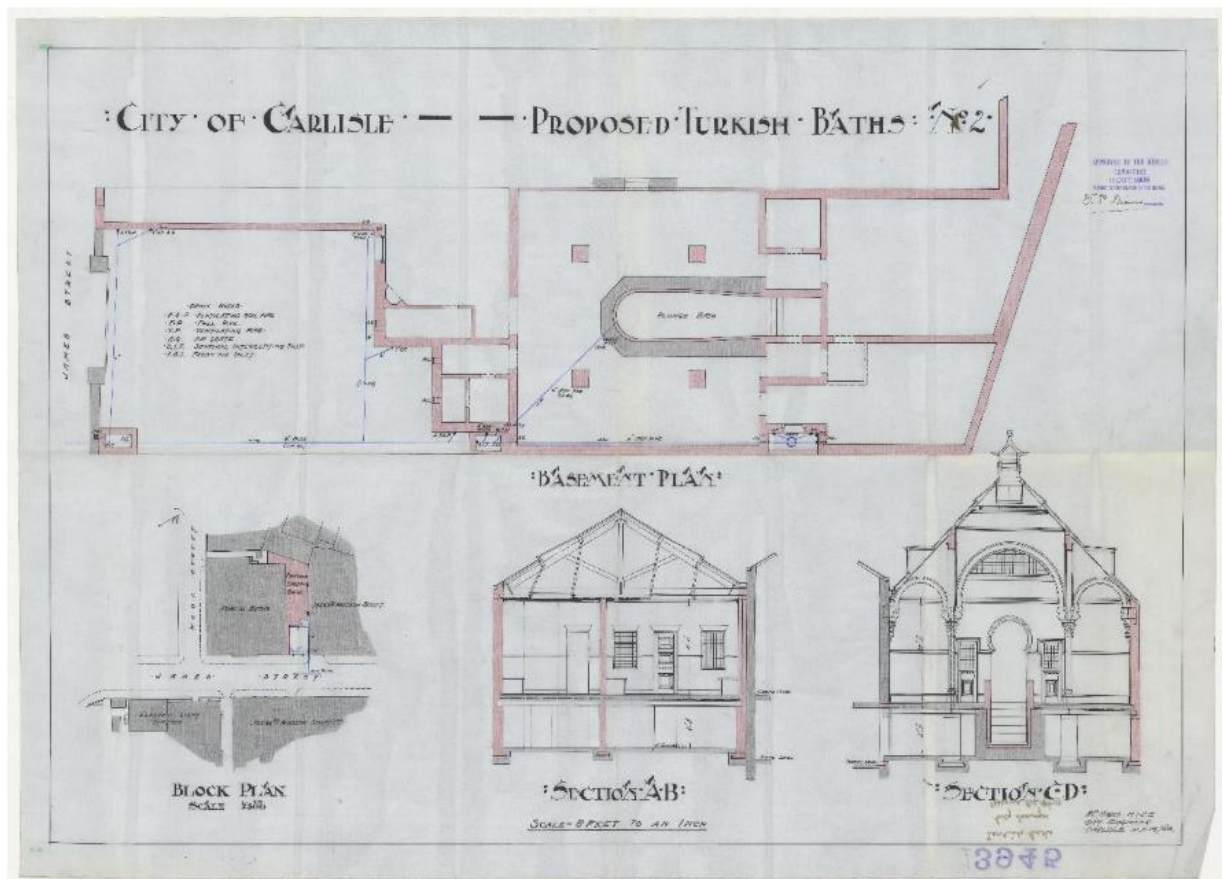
Above: Turkish Baths Section & Ground Floor Plan (Cumbria Archives)
